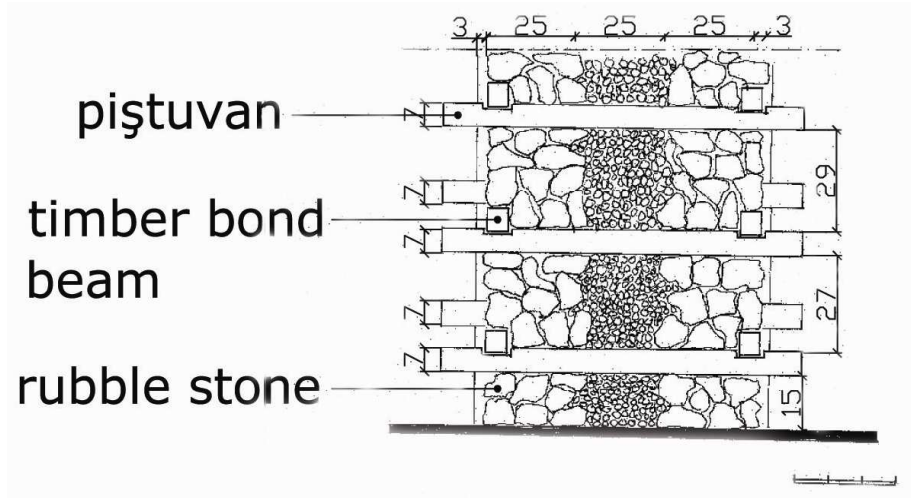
9 Drawing of the wall type 3. Çelik 2008.
